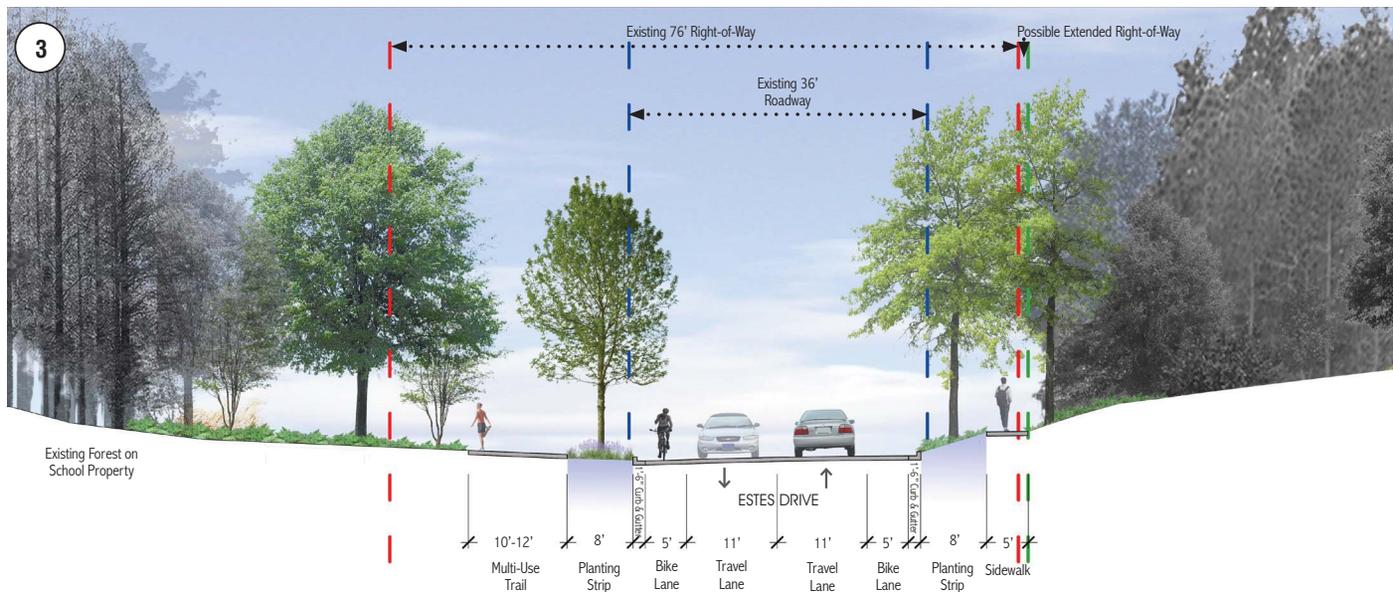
Estes Drive Cross-Sections: School Zone (Looking East)
